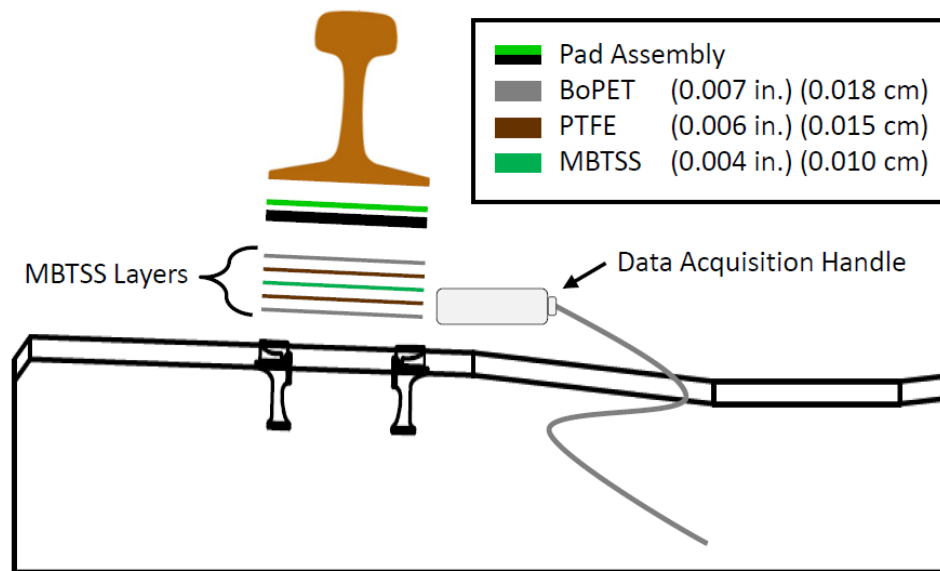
Exploded View of a Tekscan® Sensor (7)
